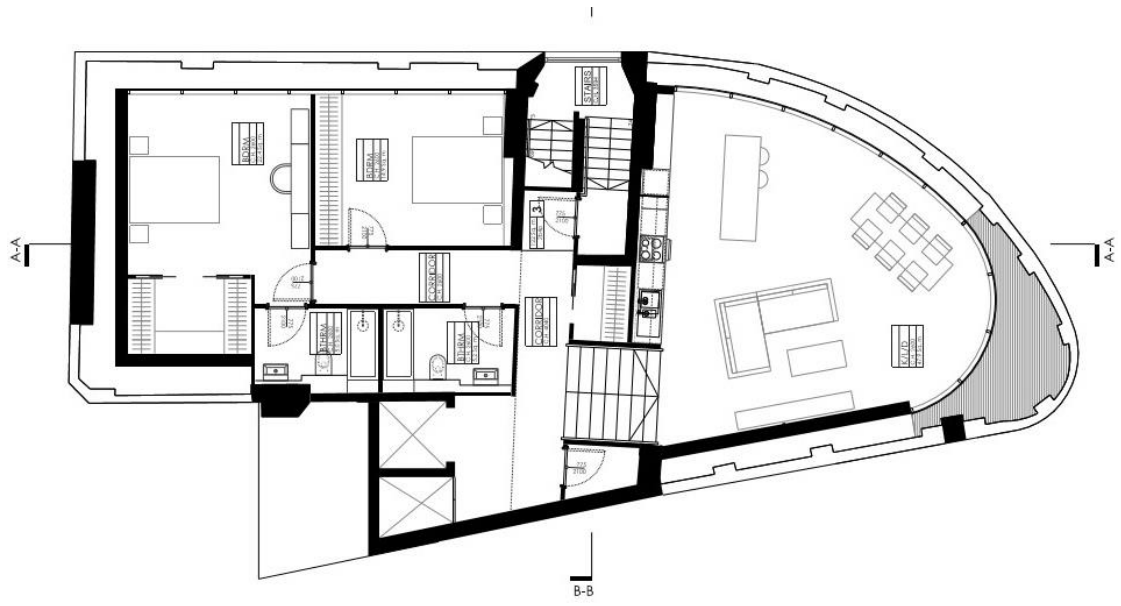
Proposed Layout Plan of the Proposed Dwelling at fifth floor level
